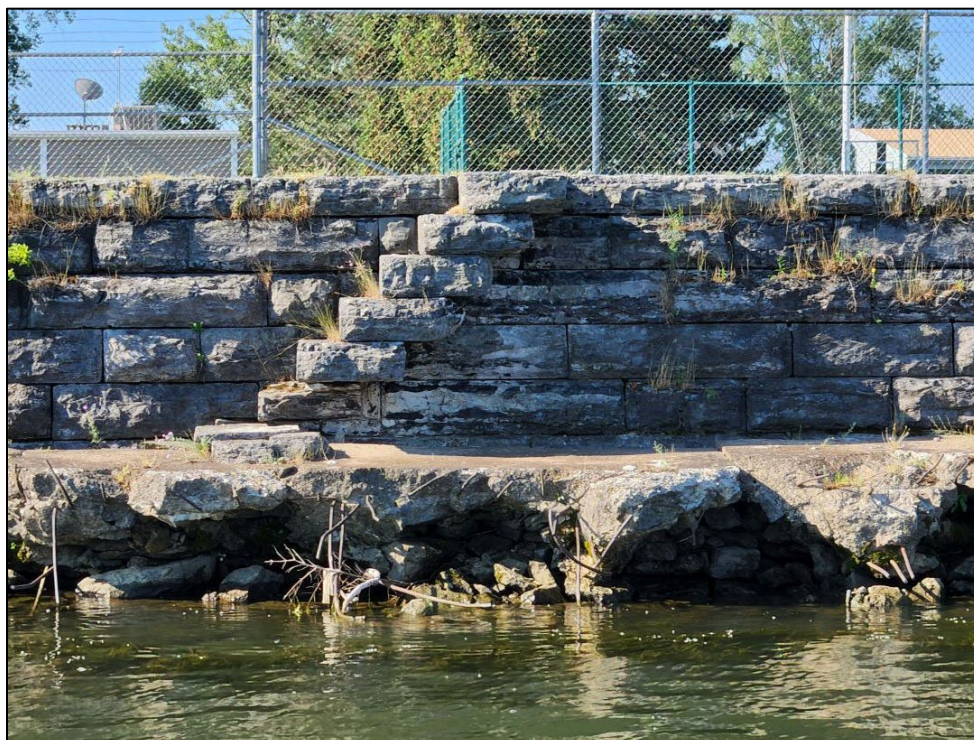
Looking down at the original 1820s stone stairs (photo by ERDC-CERL researchers, 2022).
